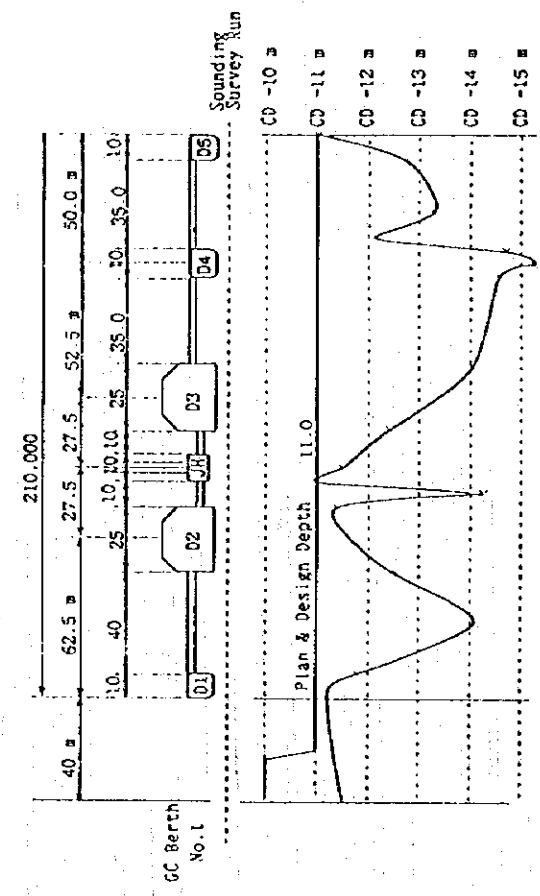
(3) Deeping Structure (SSP Wall)
